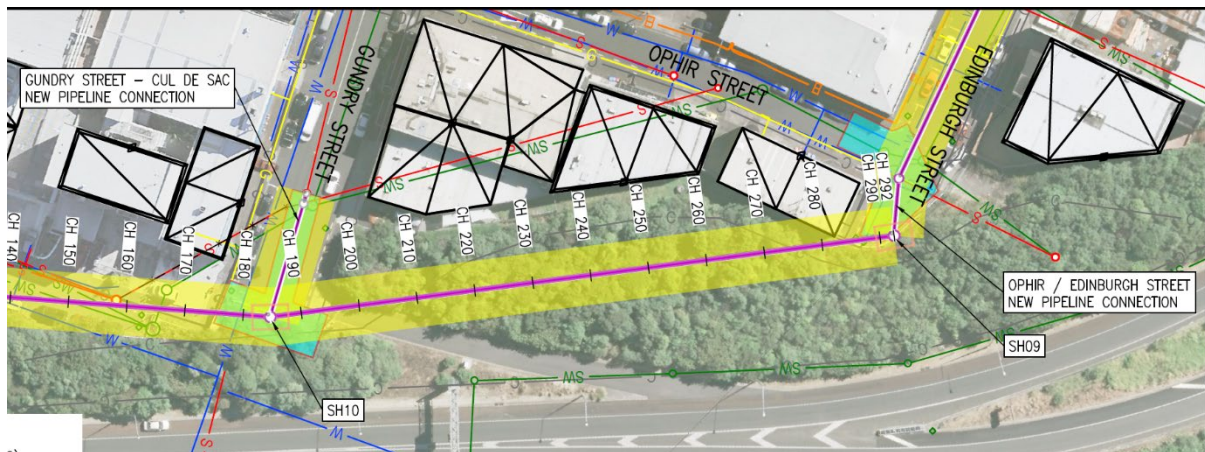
SH09 shaft location to the south of Edinburgh Street and SH10 to the south of Gundry Street
